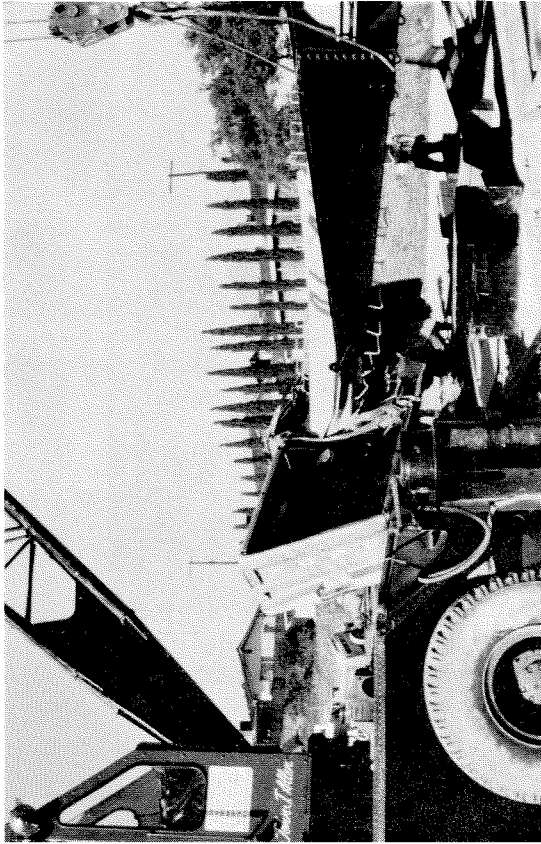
An electrical transmission tower under construction failed at an incomplected joint near the base of the tower.
